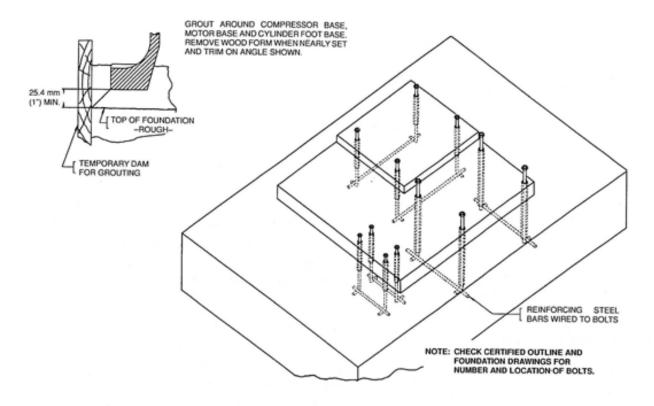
TYPICAL FOUNDATION WHEN COMPRESSOR IS MOUNTED DIRECTLY ON FOUNDATION
